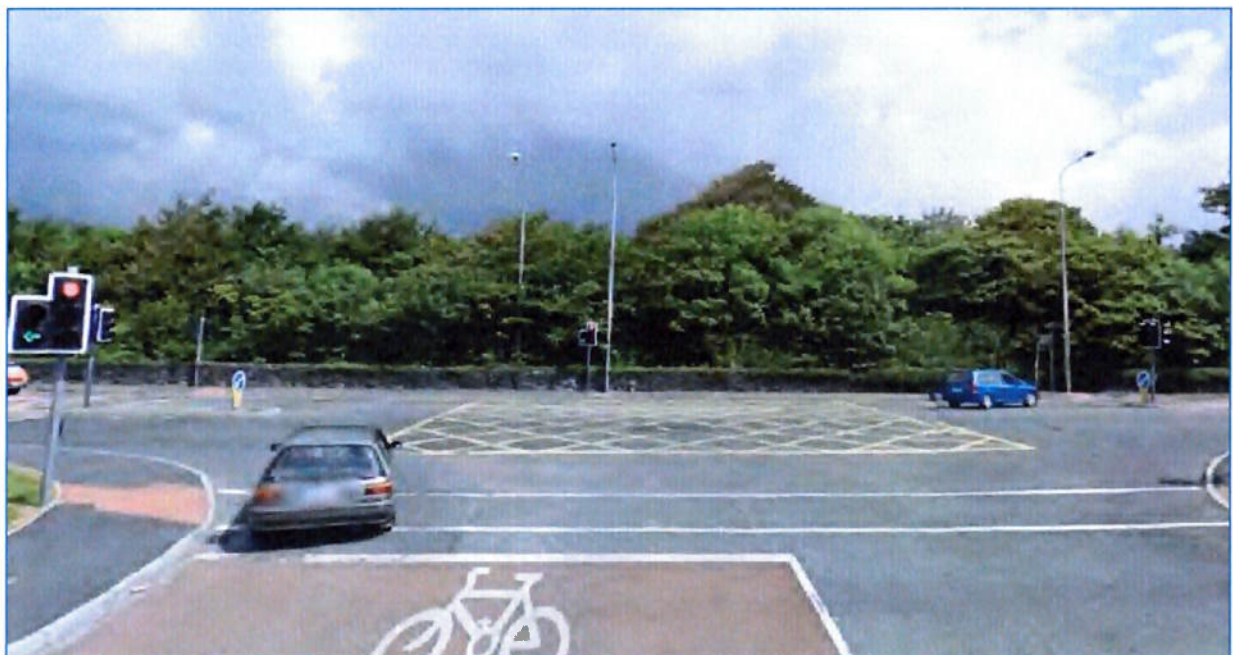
Looking north from Murrough Junction towards proposed entrance. The boundary wall is a townland wall but of relatively modern construction.
